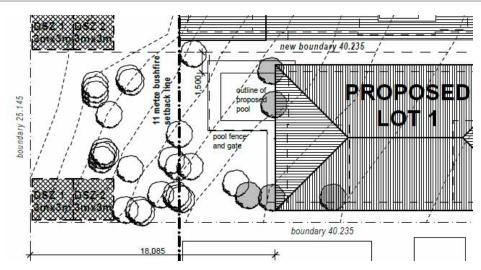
extract from Site Plan WD 0.03 Rev B - Tree Removal
